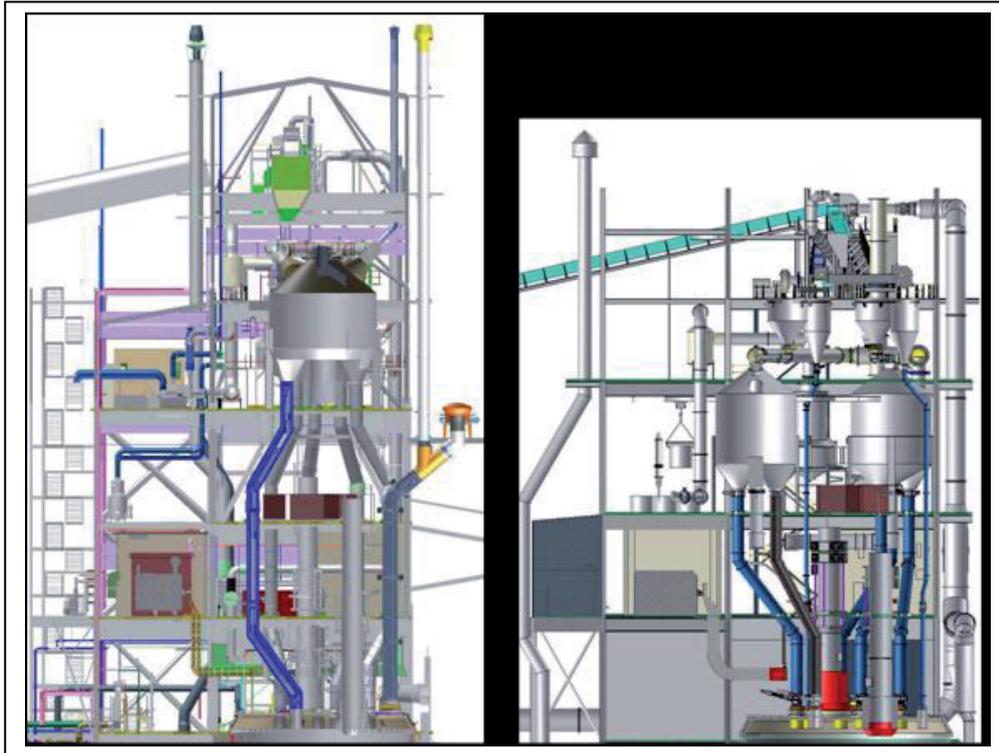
Elevation view of a single and multiple pre-heater systems in a ferrochrome plant
